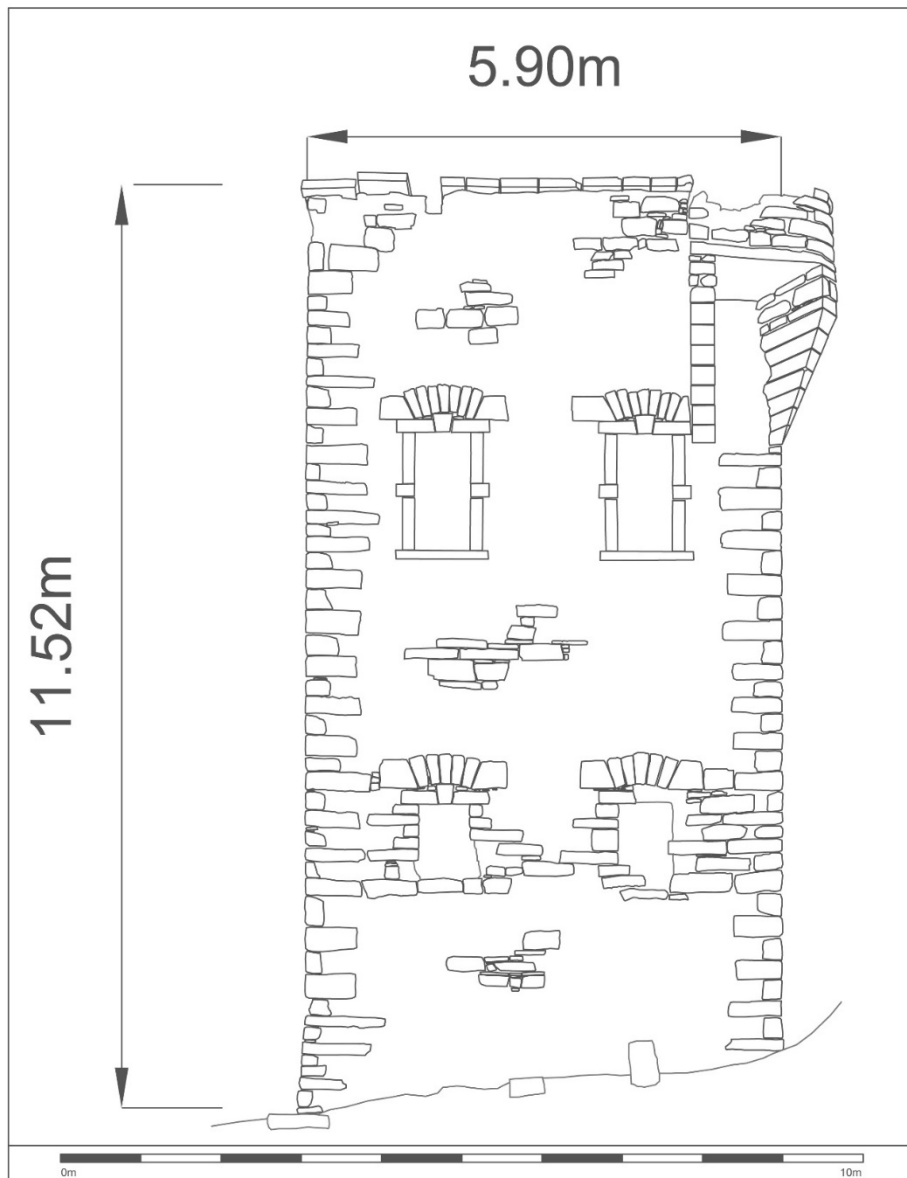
External elevation of the south-west wall of the signal tower at Carrigan Head Signal Station.
